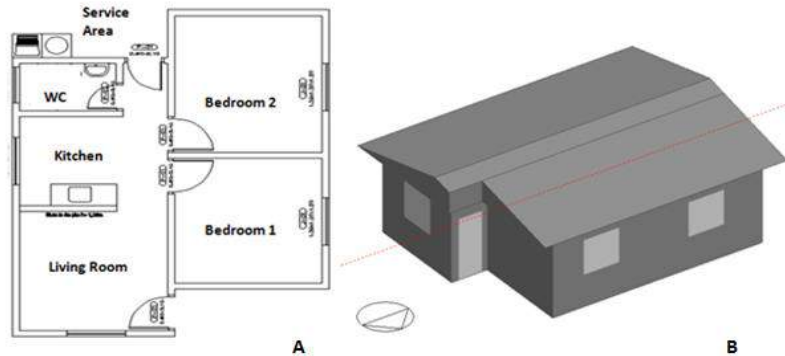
(A) Plant design and (B) DesignBuilder model of the case study. Source: Authors, 2016
